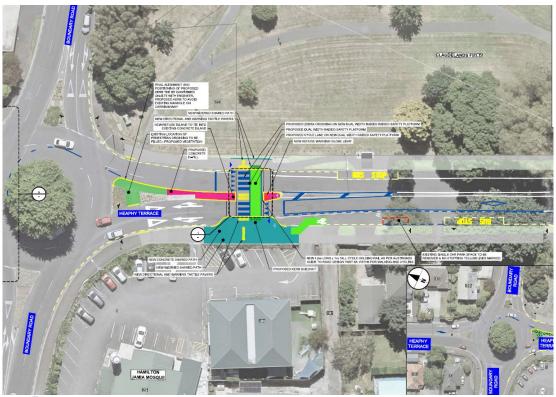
Proposed Paired Zebra Crossing on RSP and Kerb Buildout
